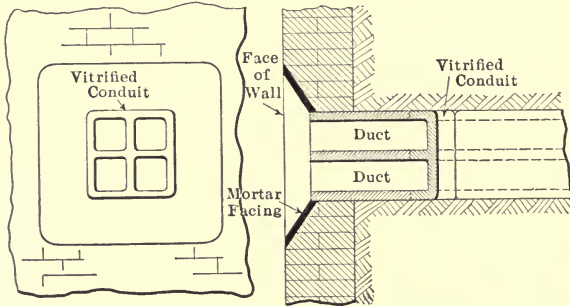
WALL FACE AT VITRIFIED CONDUIT ENTRANCE.
